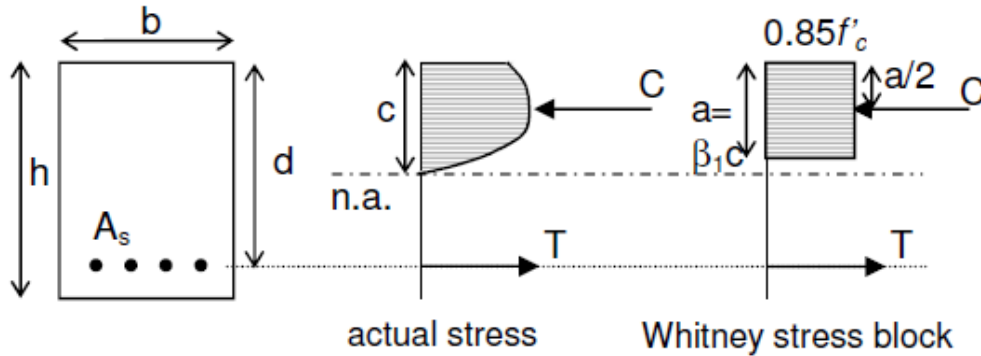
Schematic of the Whitney solution to determine the moment capability of a reinforced beam or wall section.
